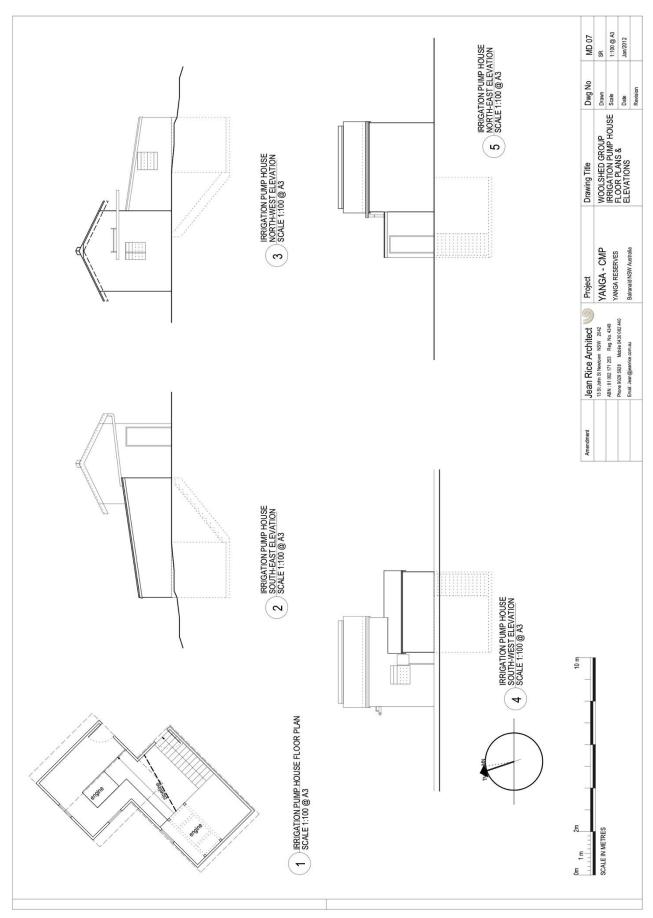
Woolshed Group Irrigation Pump House floor plan and elevations. Jean Rice Architect, site assessment 2009.
